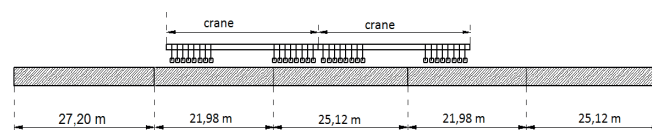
Example of tandem crane loads acting on the RCB consisting of five sections
